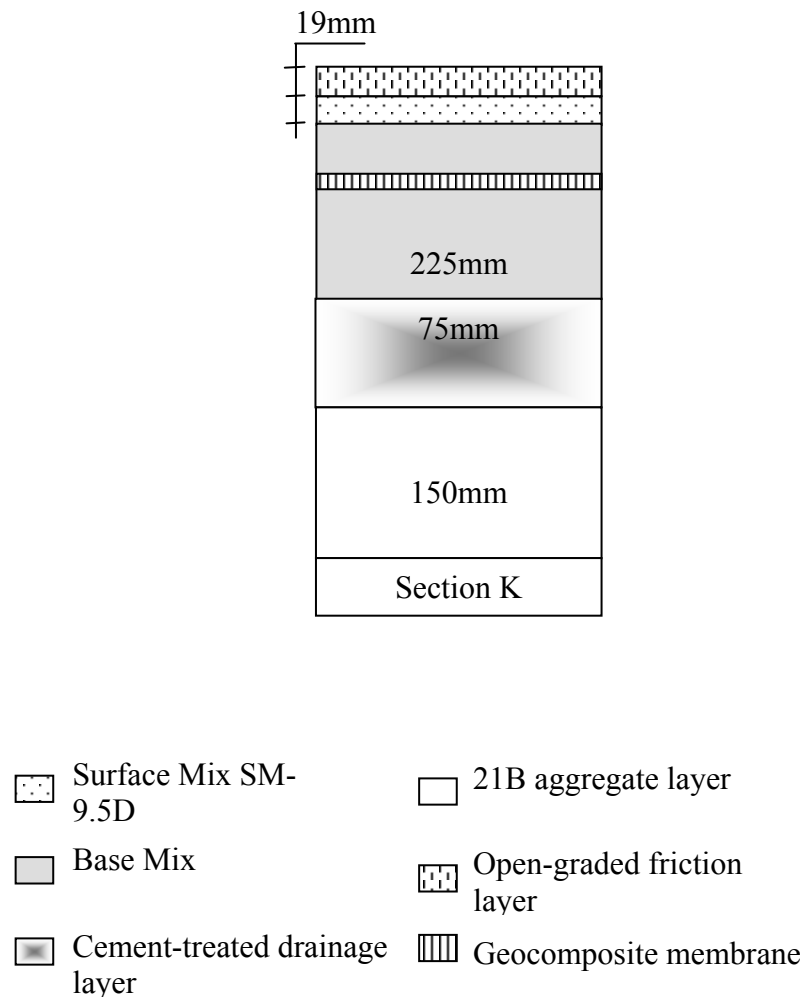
Pavement Design in Section K at the Virginia Smart Road
